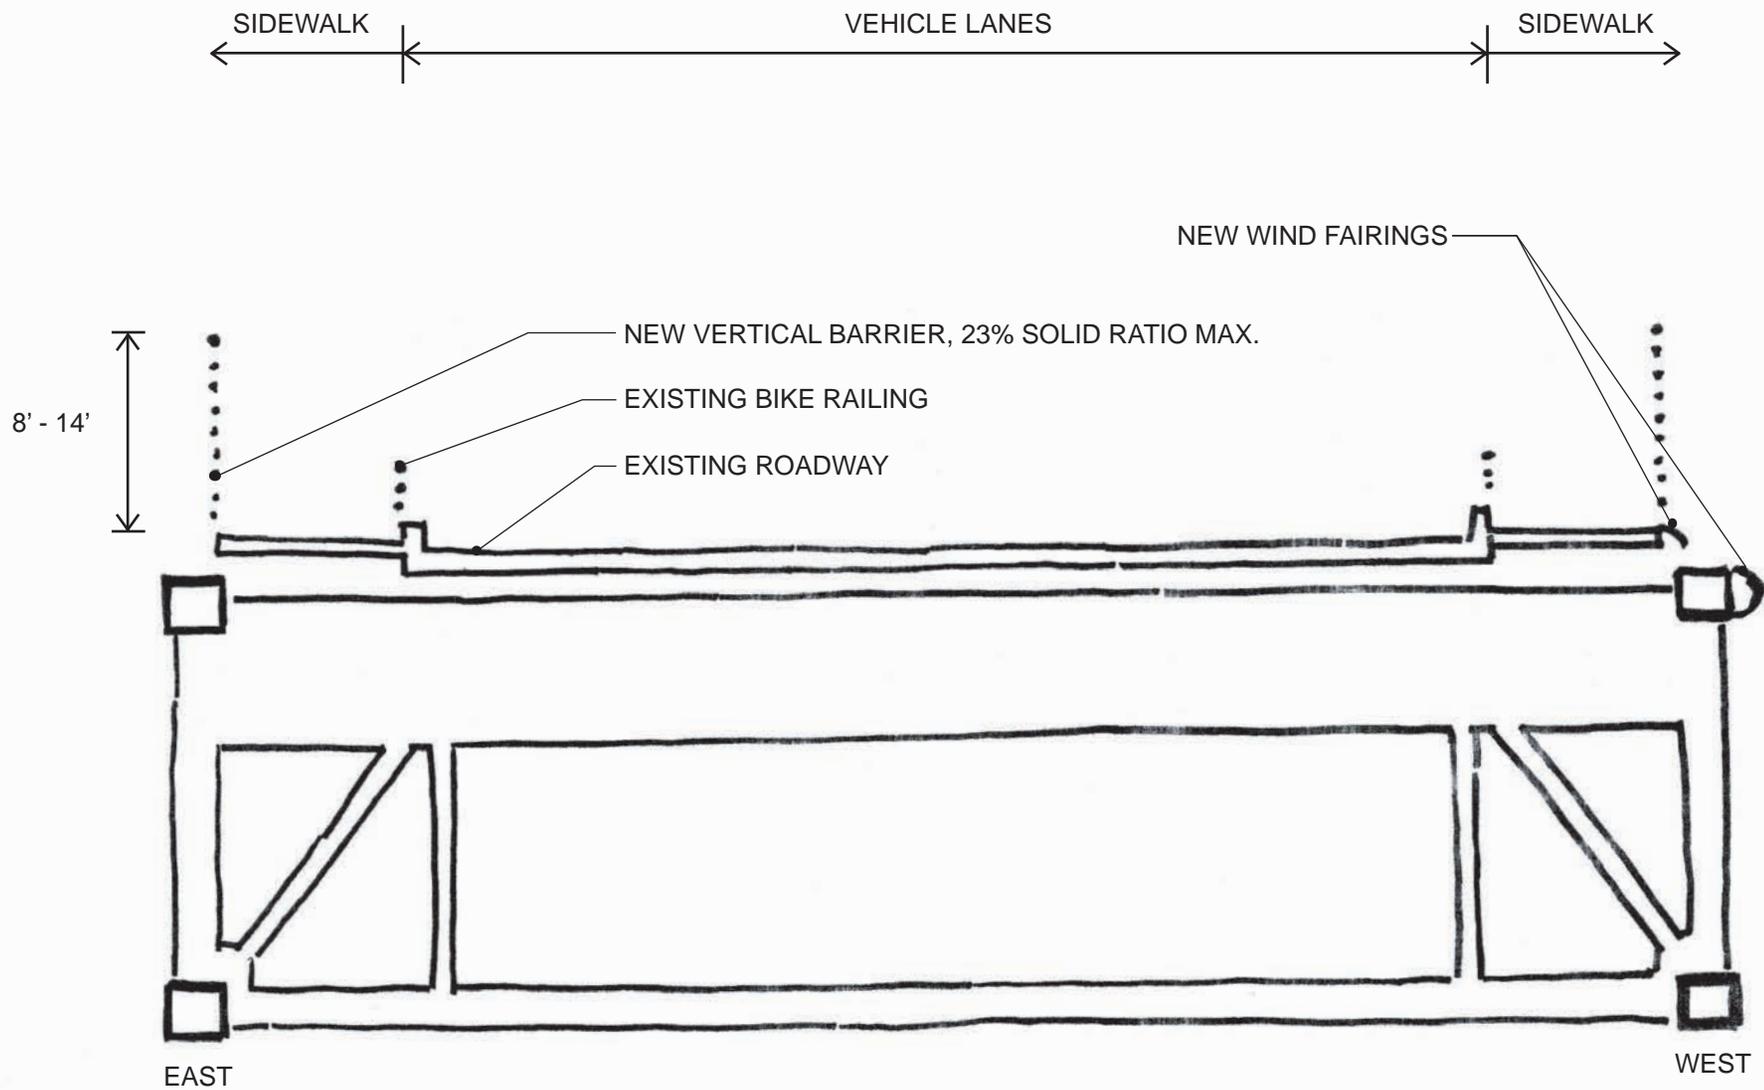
CONCEPT 2 : REPLACING THE EXISTING RAILING; WIND FAIRINGS ON TRUSS
